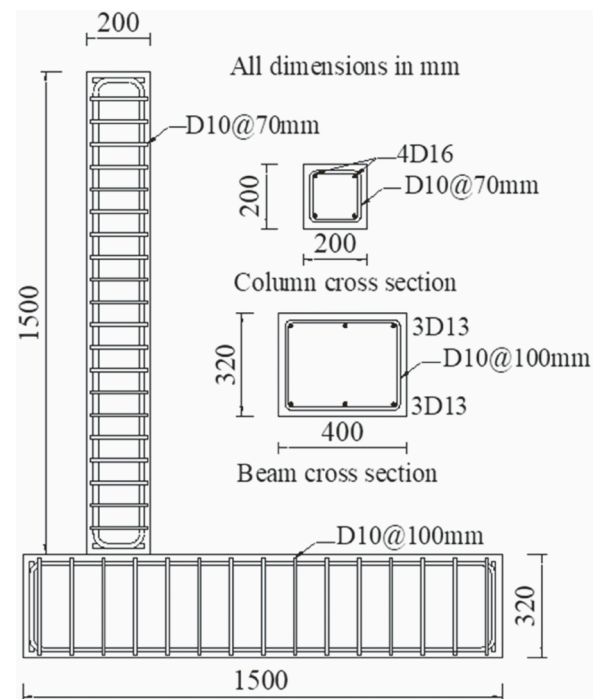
Dimension and reinforcement of the tested specimens (dimensions in mm).
